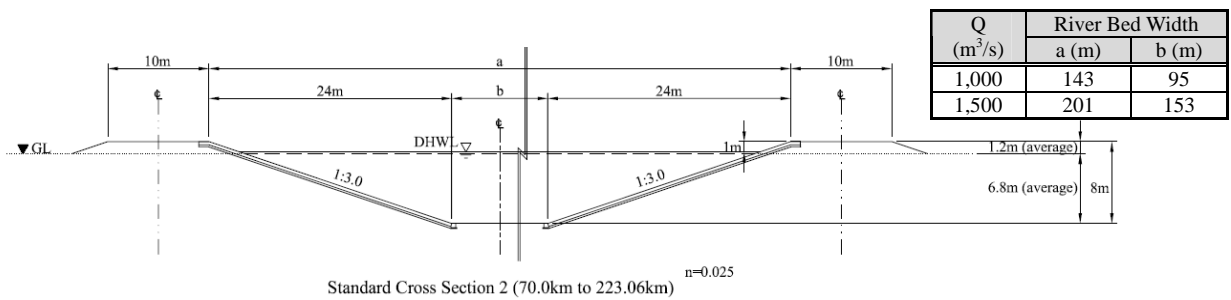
Standard Cross Section of West Diversion Channel with Slope Protection (70.0km to Diversion Point)
